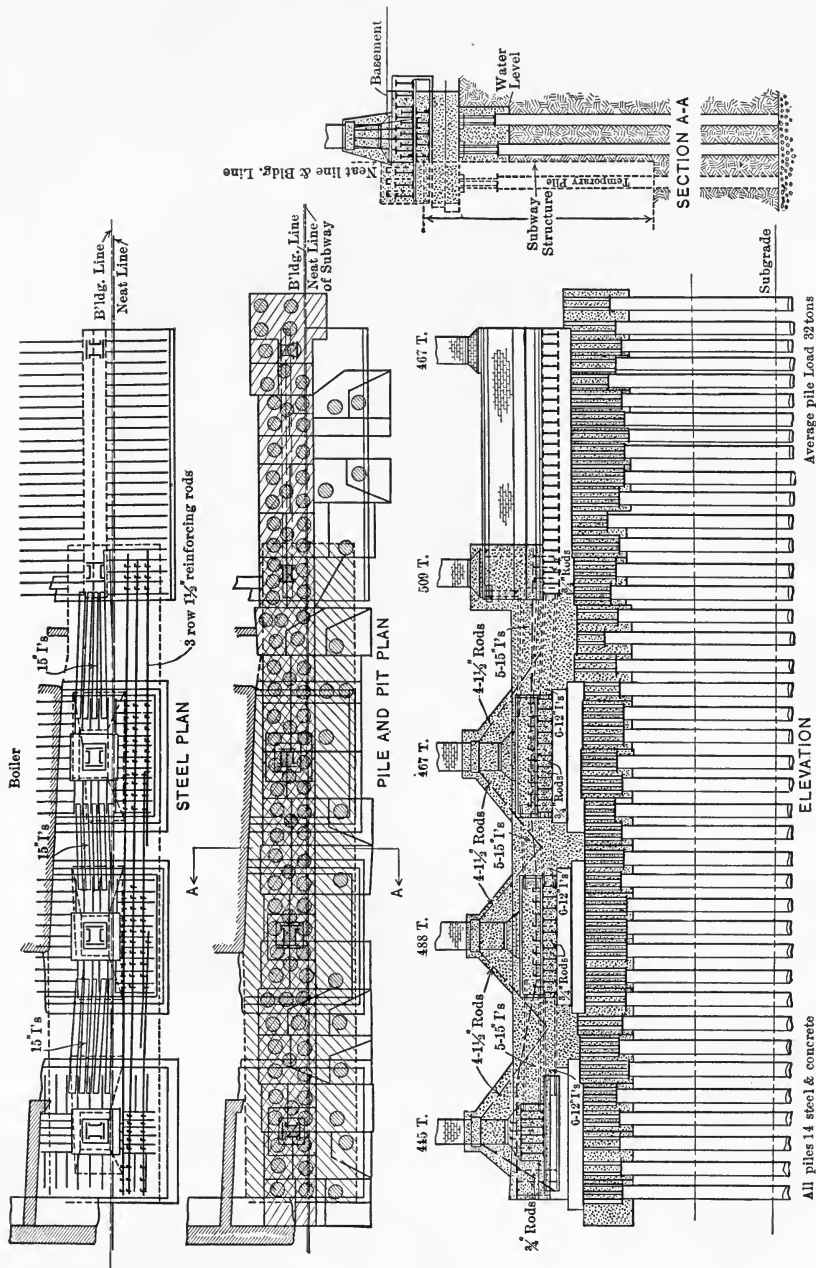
Plan of the Underpinning of the Kuhn-Loeb Building as Actually Carried Out
